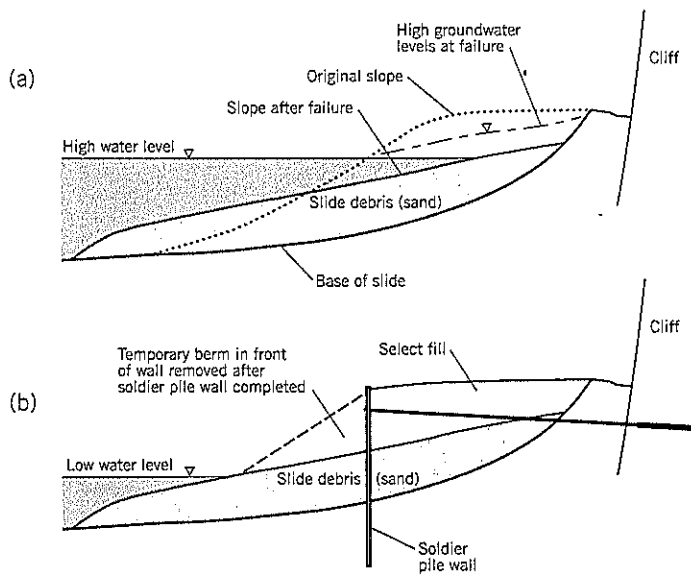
Applications for a soldier pile wall; restoration of a failed river bank: (a) slope failure (b) possible repair by use of a soldier pile wall
